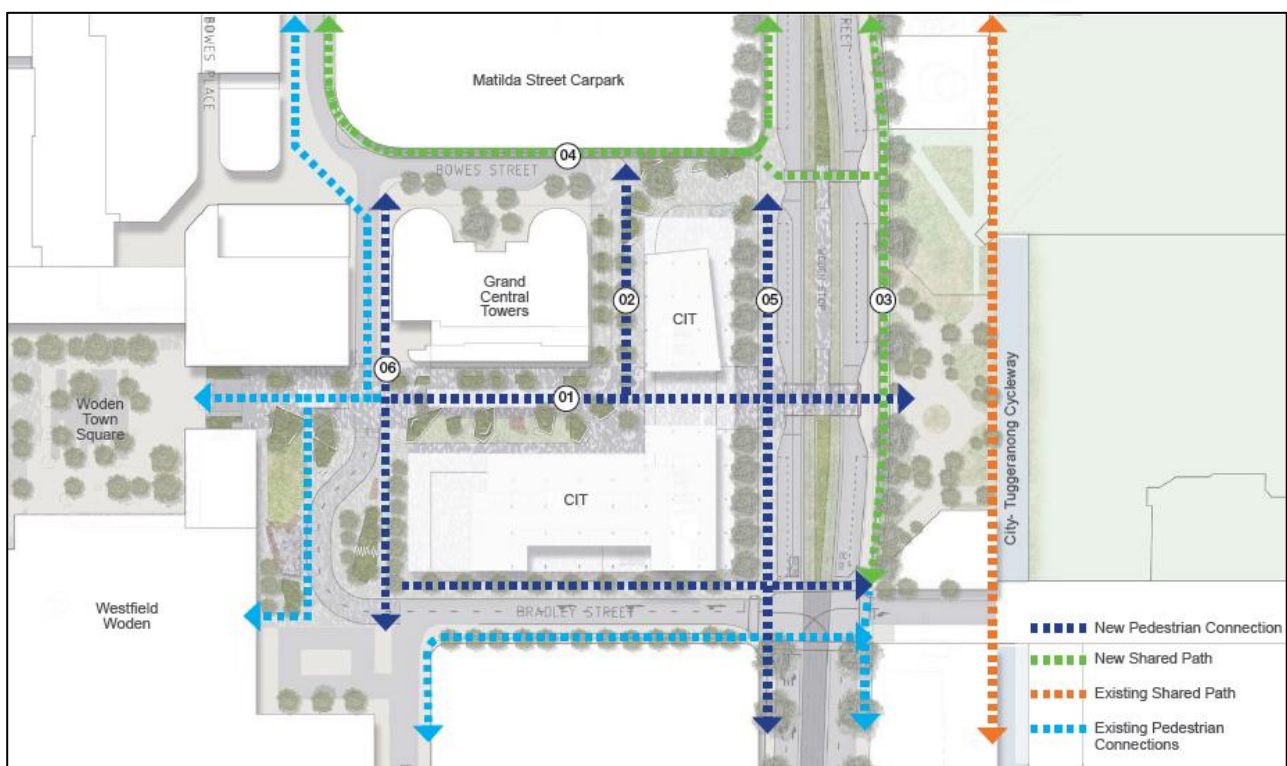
CIT Building site plan (building footprint) with key active travel routes (Source: CIT Design Report)
